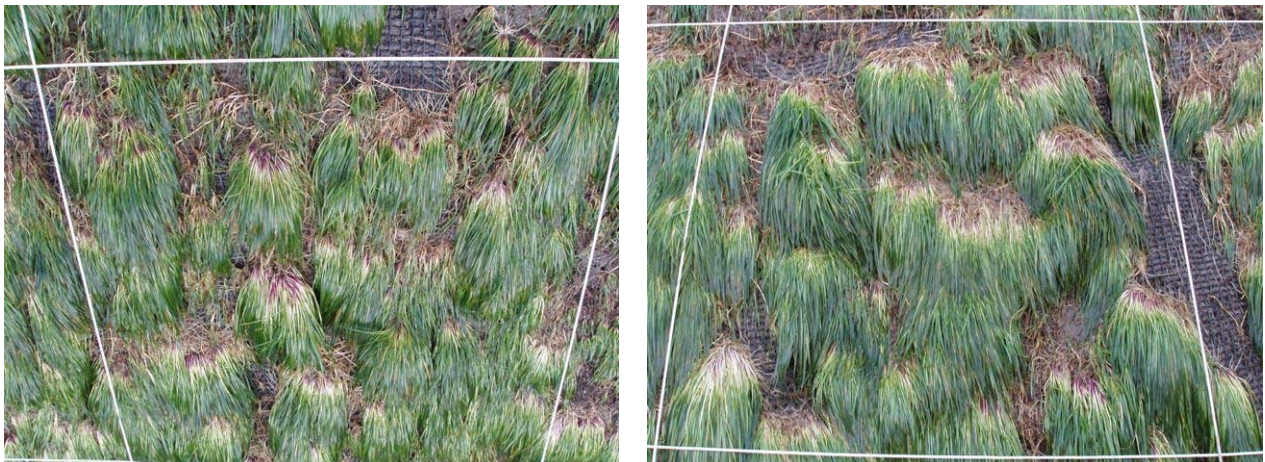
Detailed photographs of some bare spots after the '50' l/s/m test at the reinforced test section
